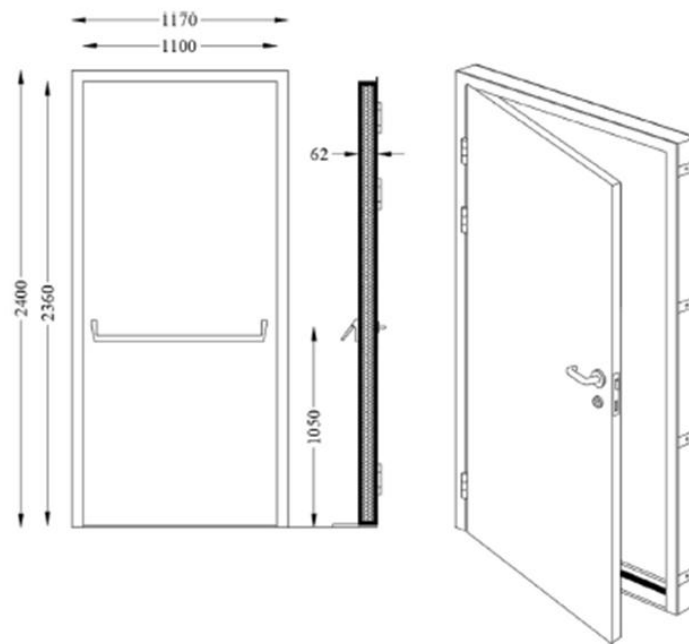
Construction details and dimensions (mm) of the tested fire door set [Calayir et. al. 2022]
